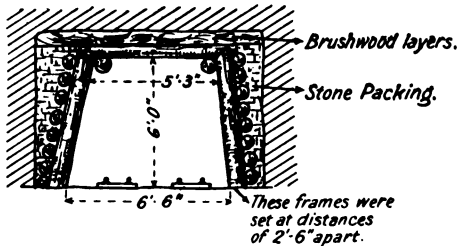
A Method of Supporting the Roof and Sides of Inclined Roads in a Belgian Colliery.
